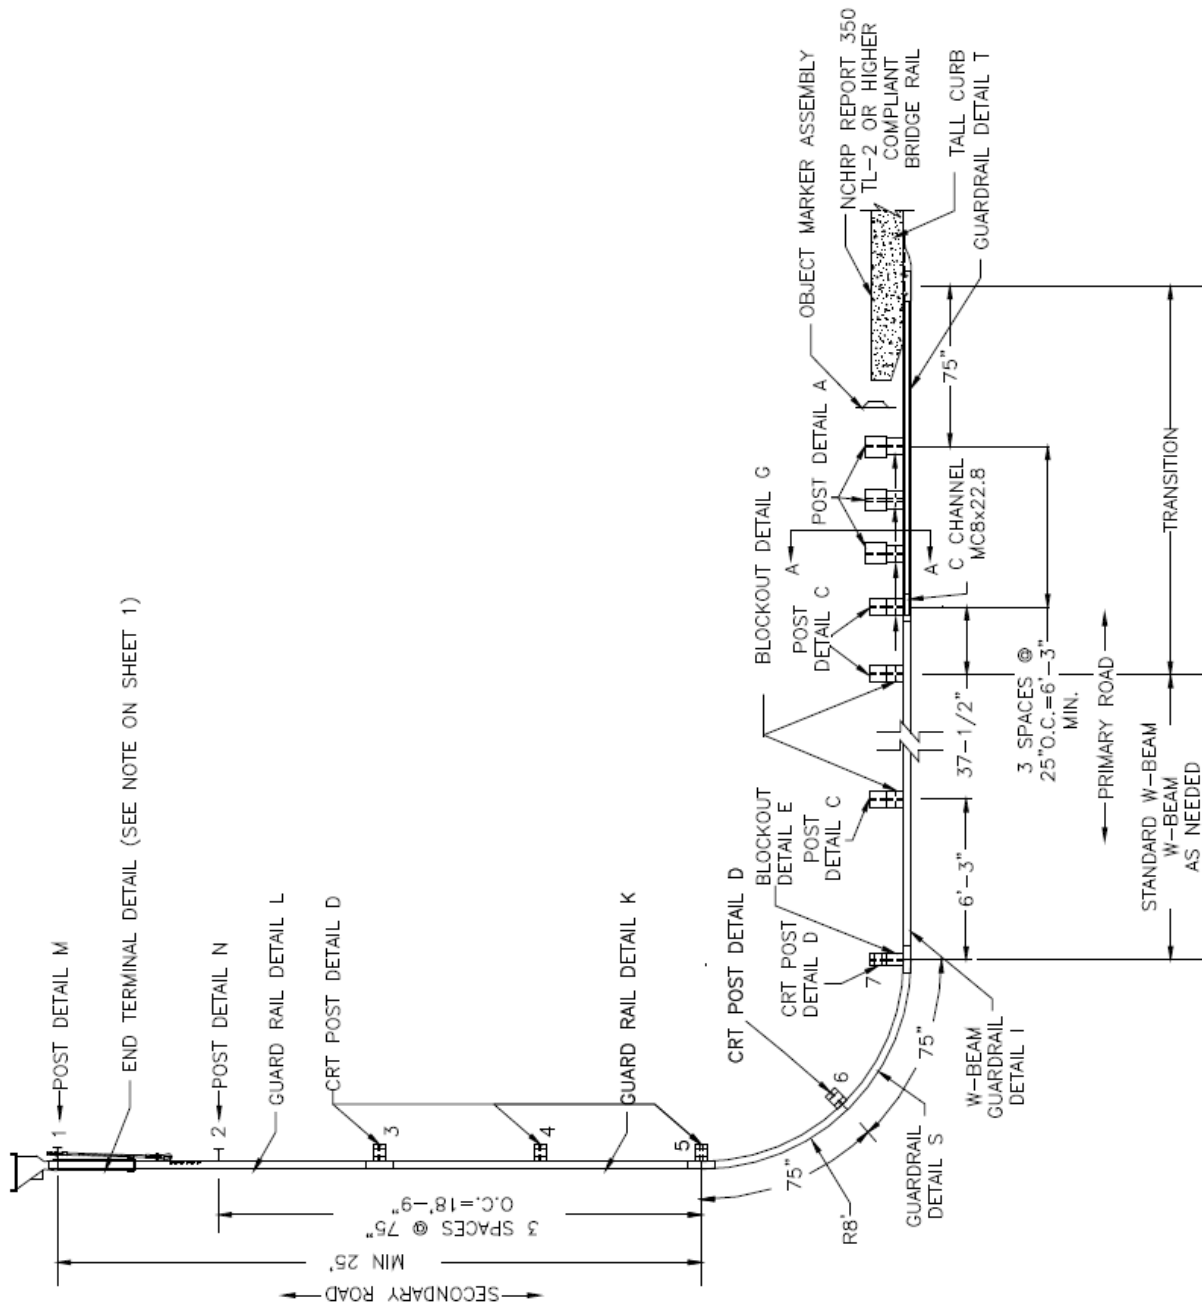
Acceptable Short-Radius Guardrail Designs, TTI NCHRP Report No. 350 TL-2 System [26]
